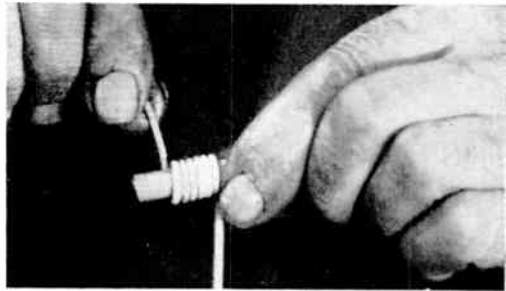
C (Top).—MAKING A COIL IN THE WIRE BEFORE FIXING TO THE BELL.
